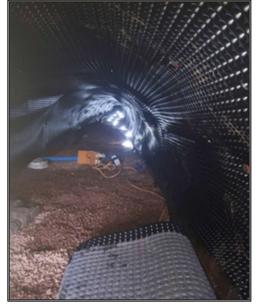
Drainage layer installed in tunnel prior to infilling (MMB)
